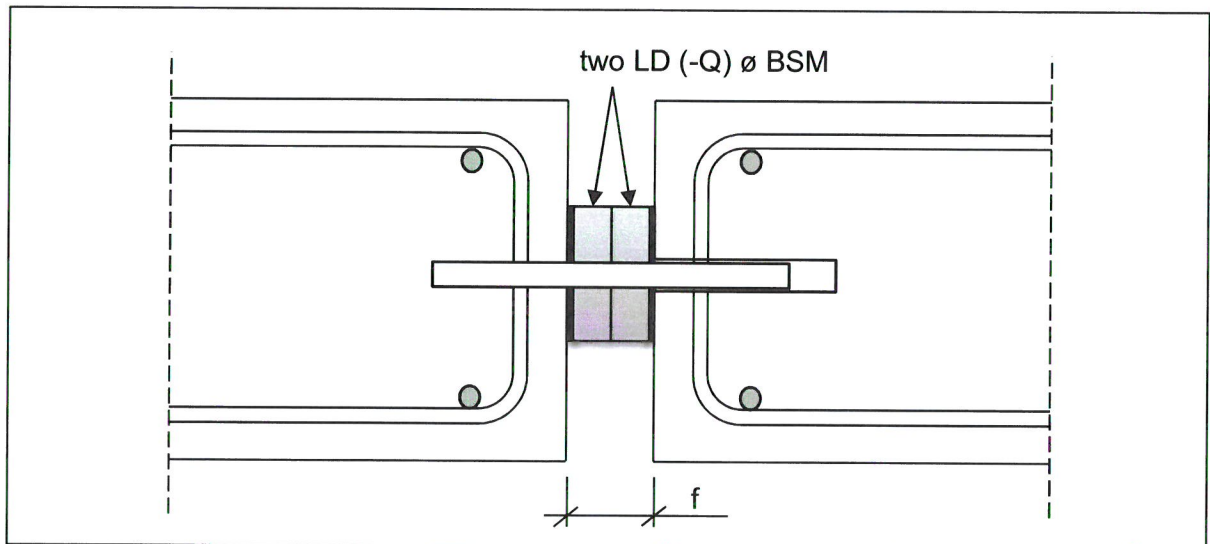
Arrangement of the LD BSM / LD-Q BSM fire protection collars for joint width wider than 30 mm
